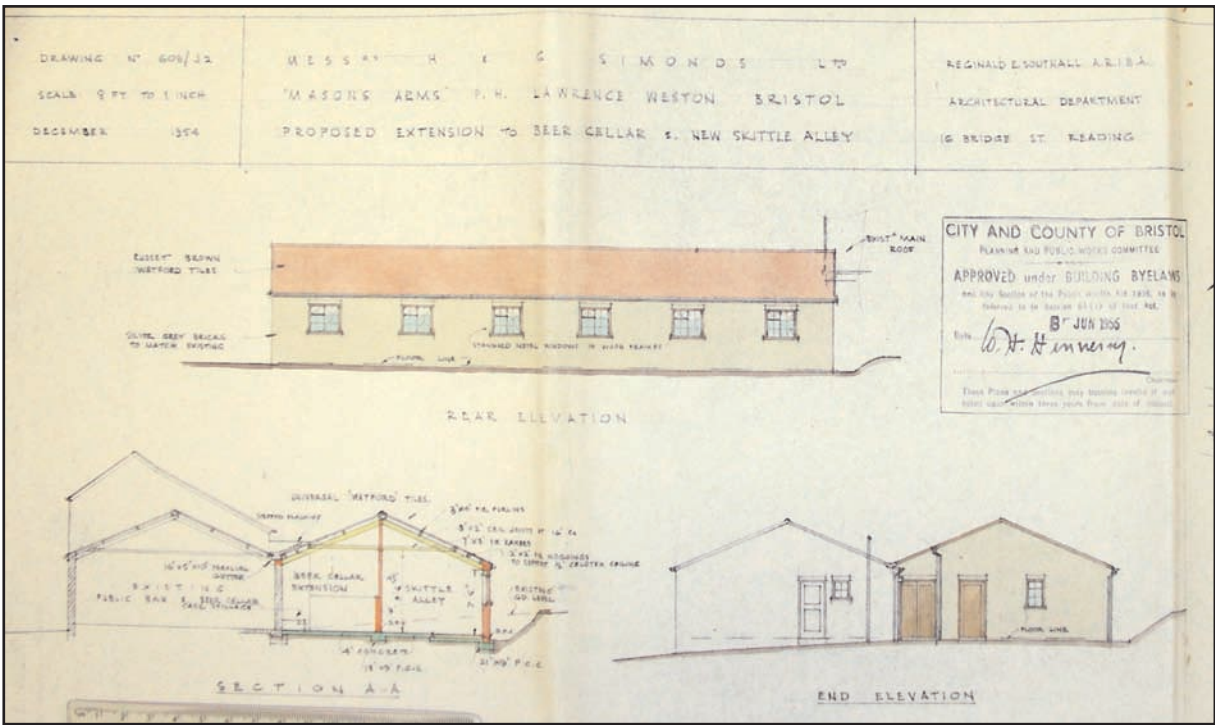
Architectural drawing (elevations) for proposed alterations and extension to the Masons Arms, dated 1954 (BCC)
